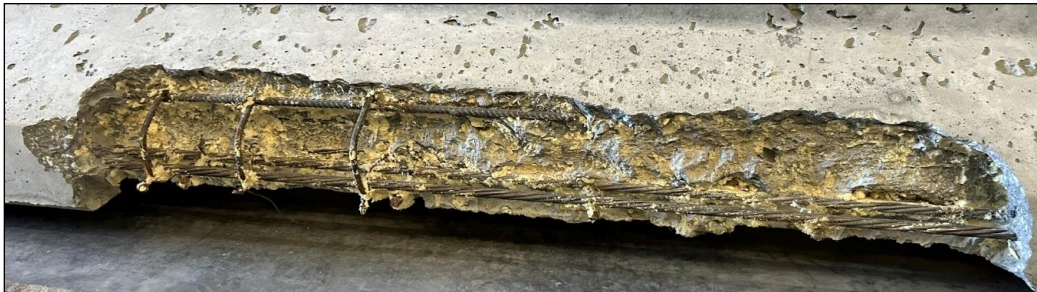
Photo. Spray foam block out in girder repair section before cleaning.
